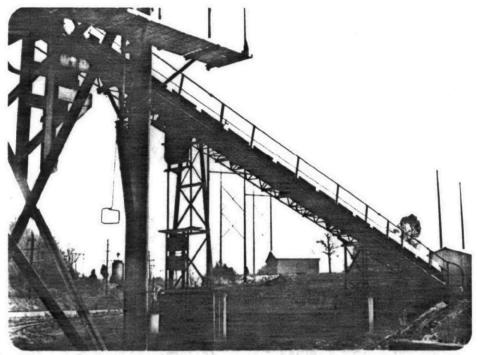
View from ground level facing north showing coal transfer house and conveyors. The coal storage area is in the background.
